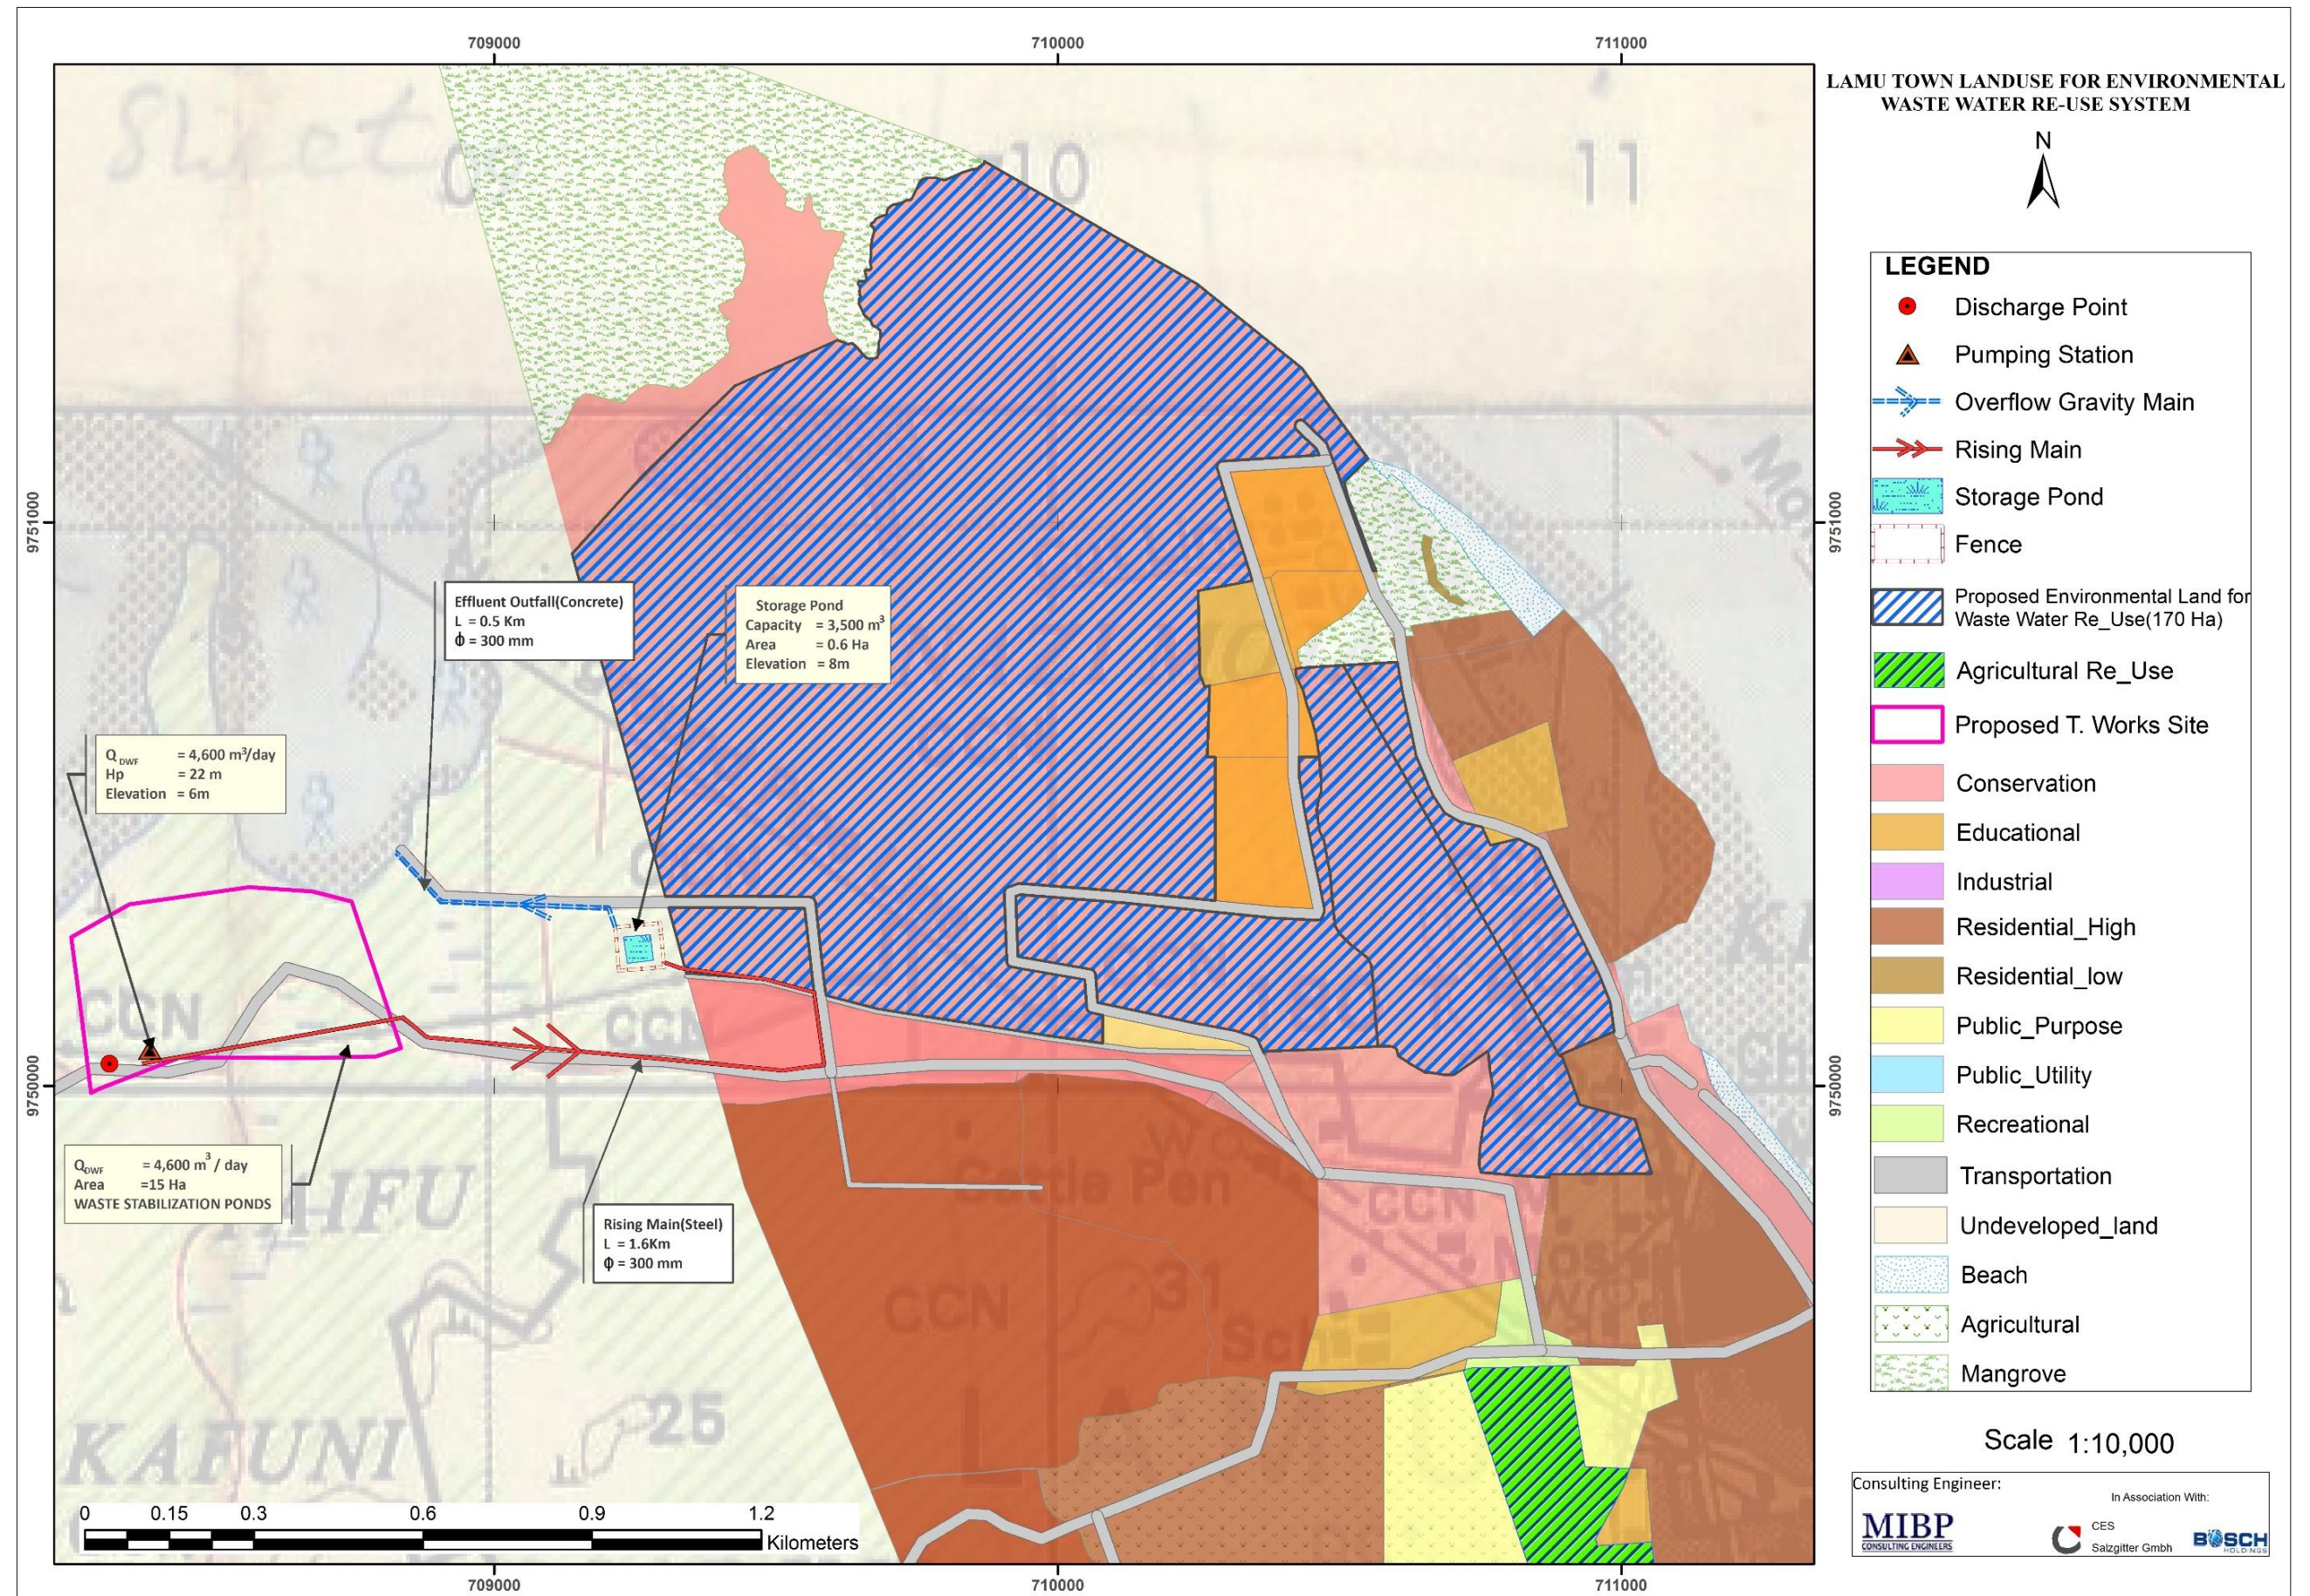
Layout Plan of the Conveyance and Storage System for Agricultural Wastewater Reuse – Lamu
